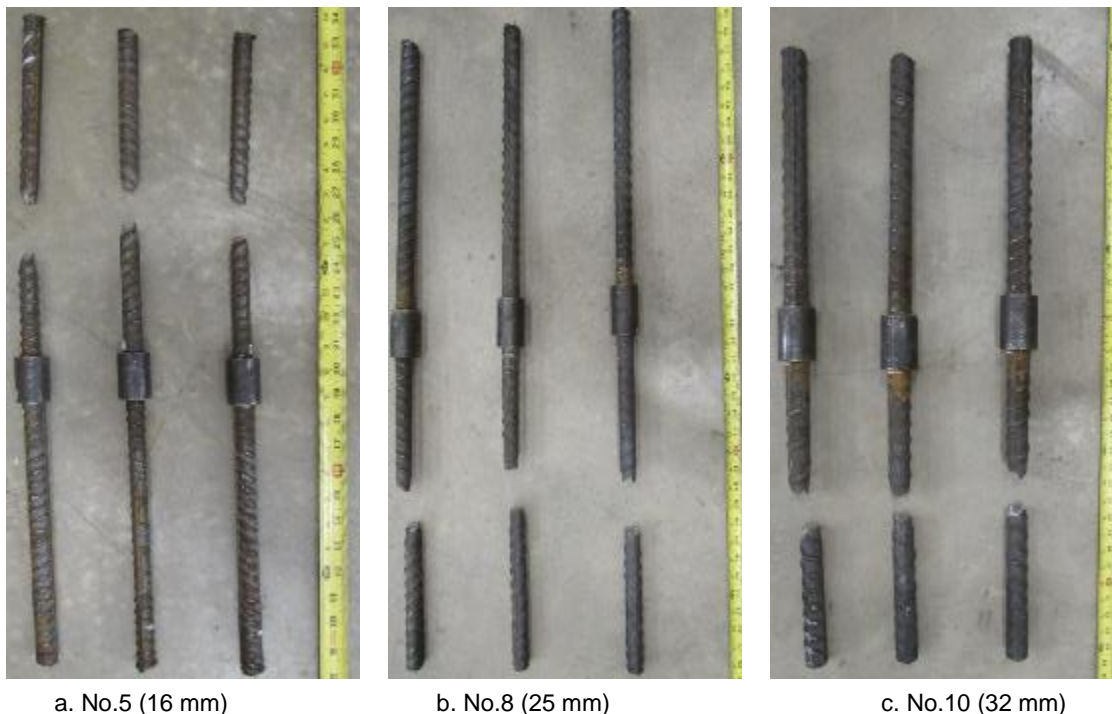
Failure of threaded couplers (Type B) under cyclic loading
